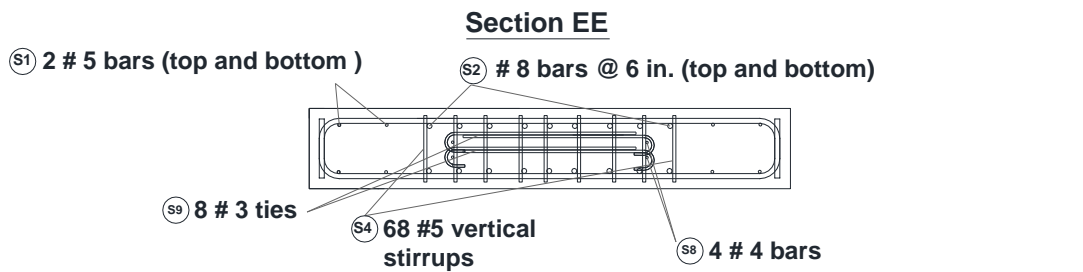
Elevation view of slab reinforcement at Section EE for Specimen #1
